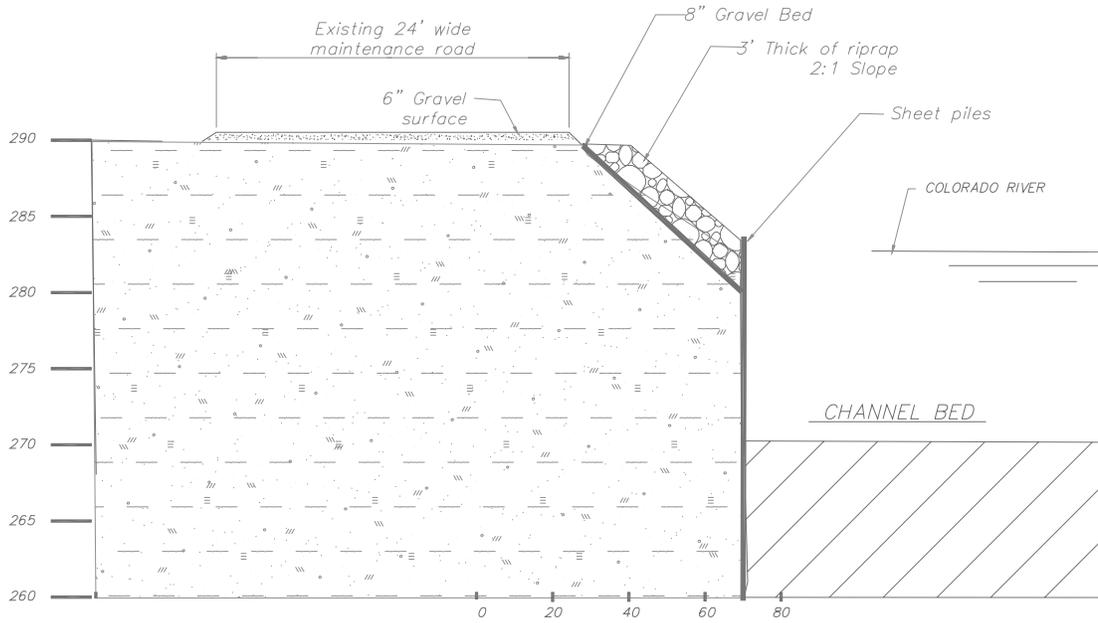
Typical Cross Section for Riprap Over Sheetpile (Drwng # LB873OPT.DWG)
